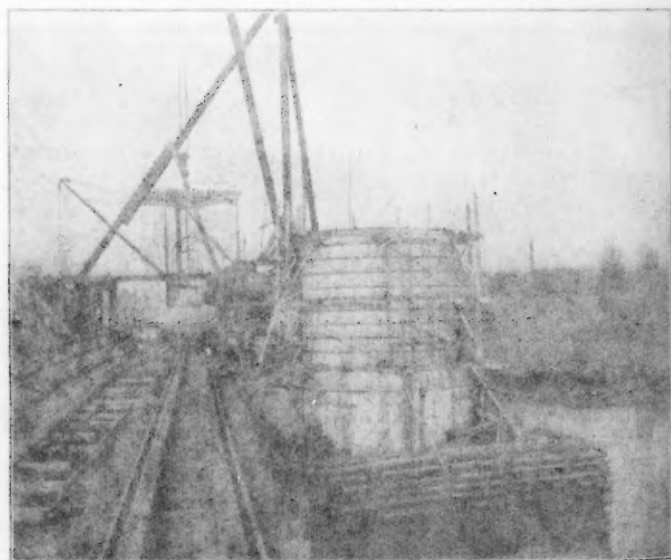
PIERS FOR LITTLE HELL GATE BRIDGE PROTECTED BY HEAVY CHAIN
